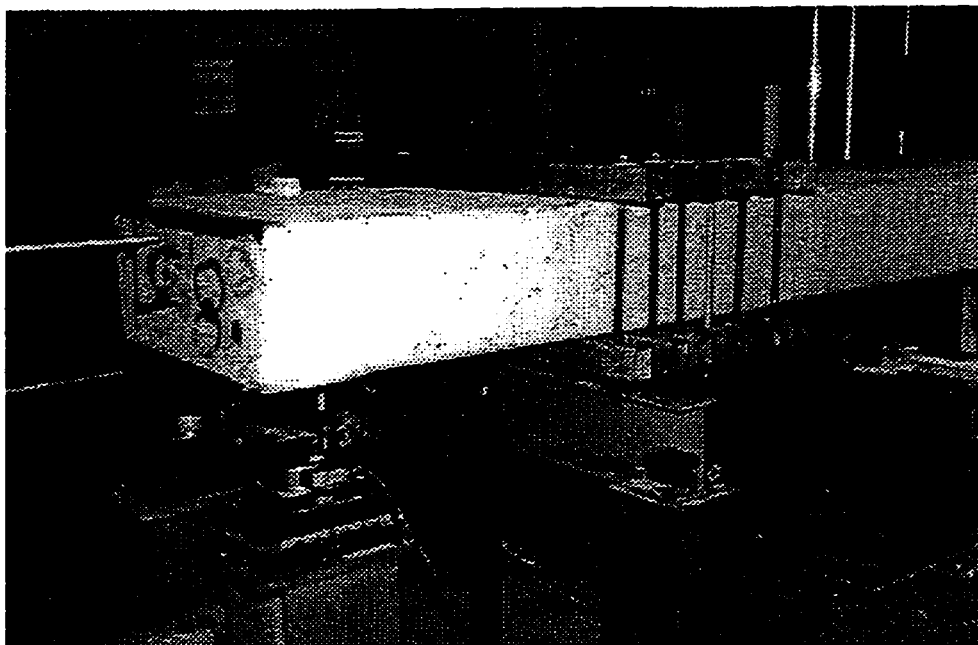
Photo of External Steel Stirrup Strengthening
